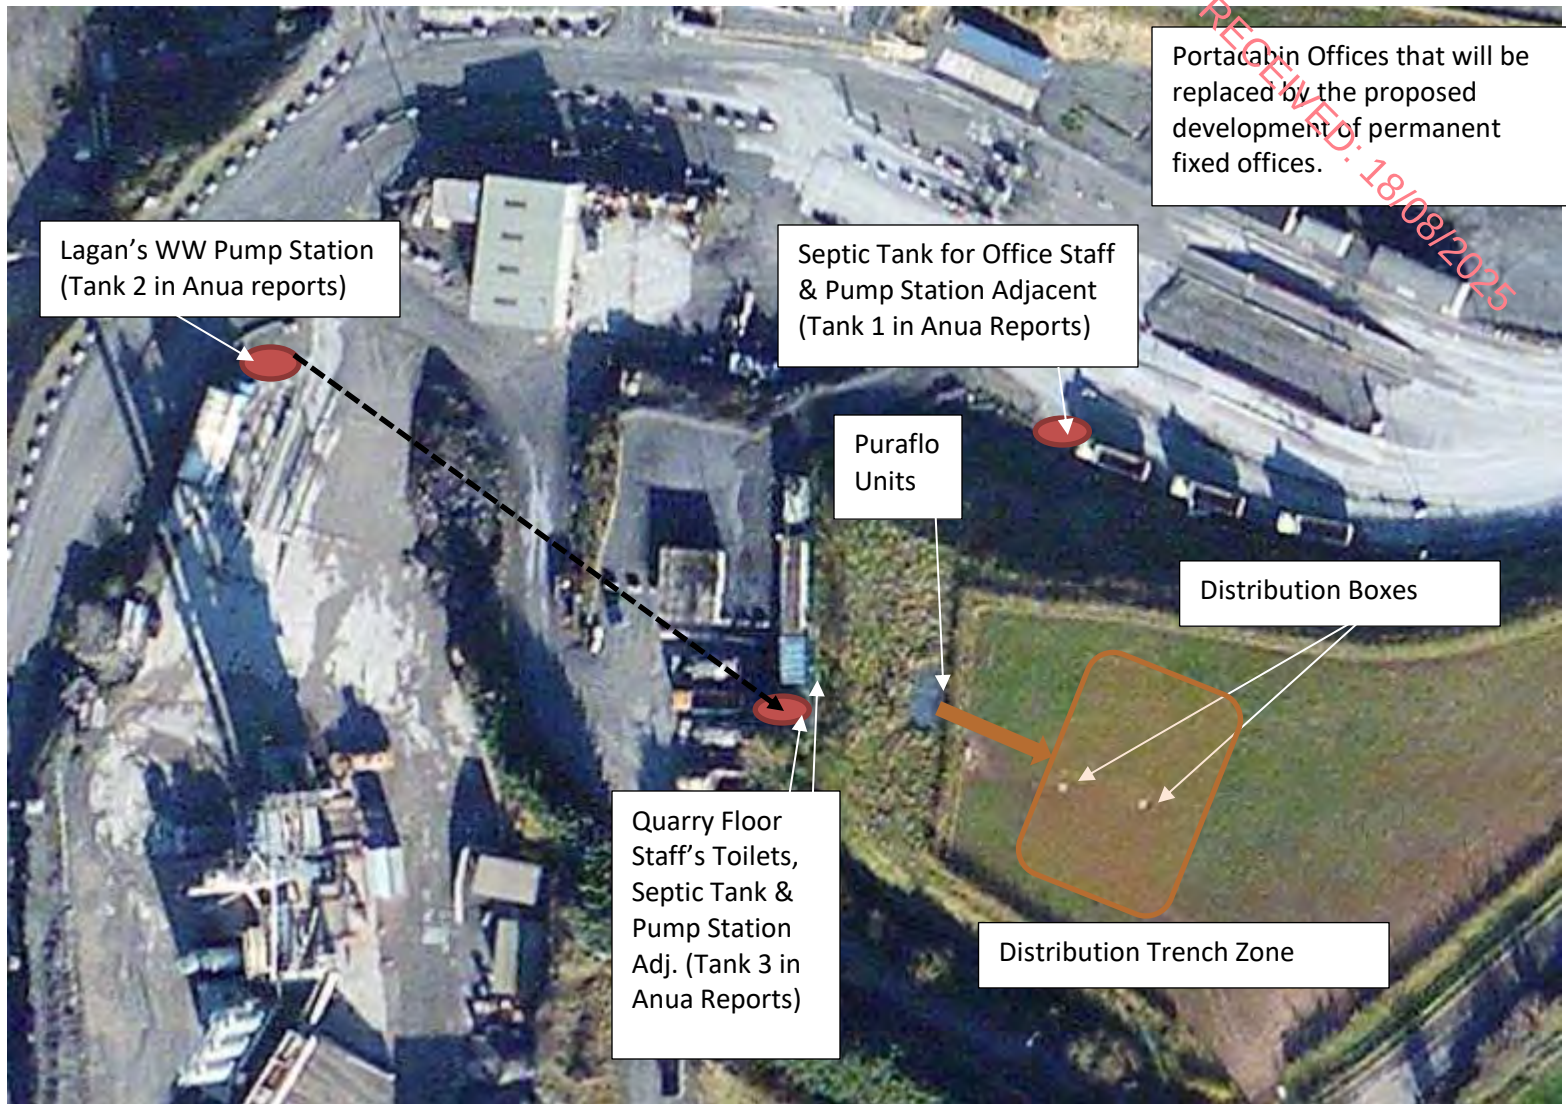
Hydro-G labelled Aerial Photo showing Puraflo units and distribution boxes (source, GSi ortho 2010). REFER TO DWG Site Layout for detail.
